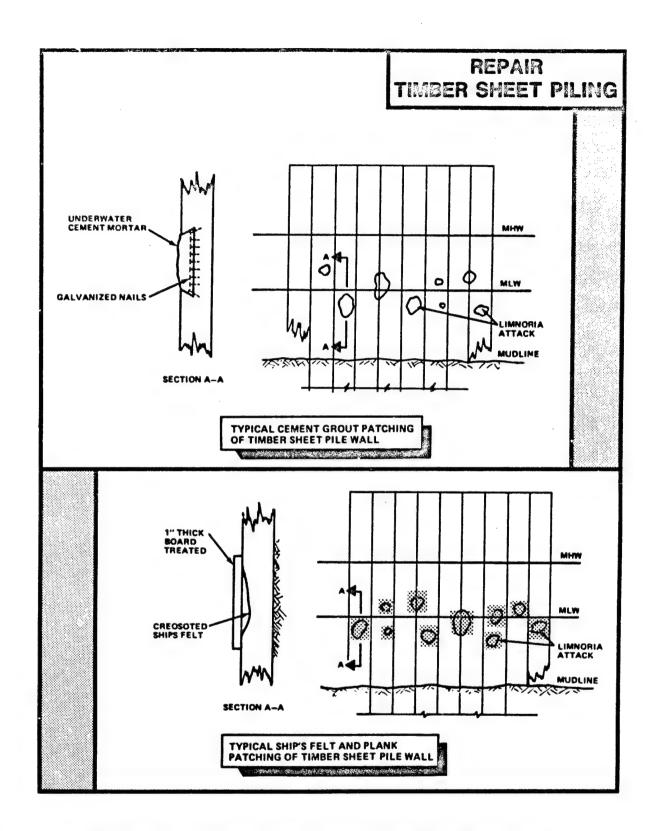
Patching Small Holes in Timber Sheet Piling Walls.
